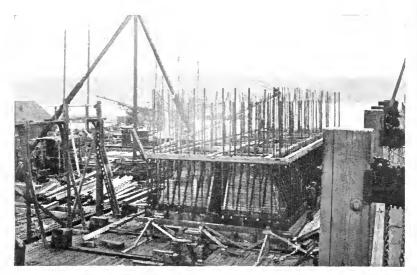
Cutting Edge of Pier 3 on Railway, showing Reinforcement.
